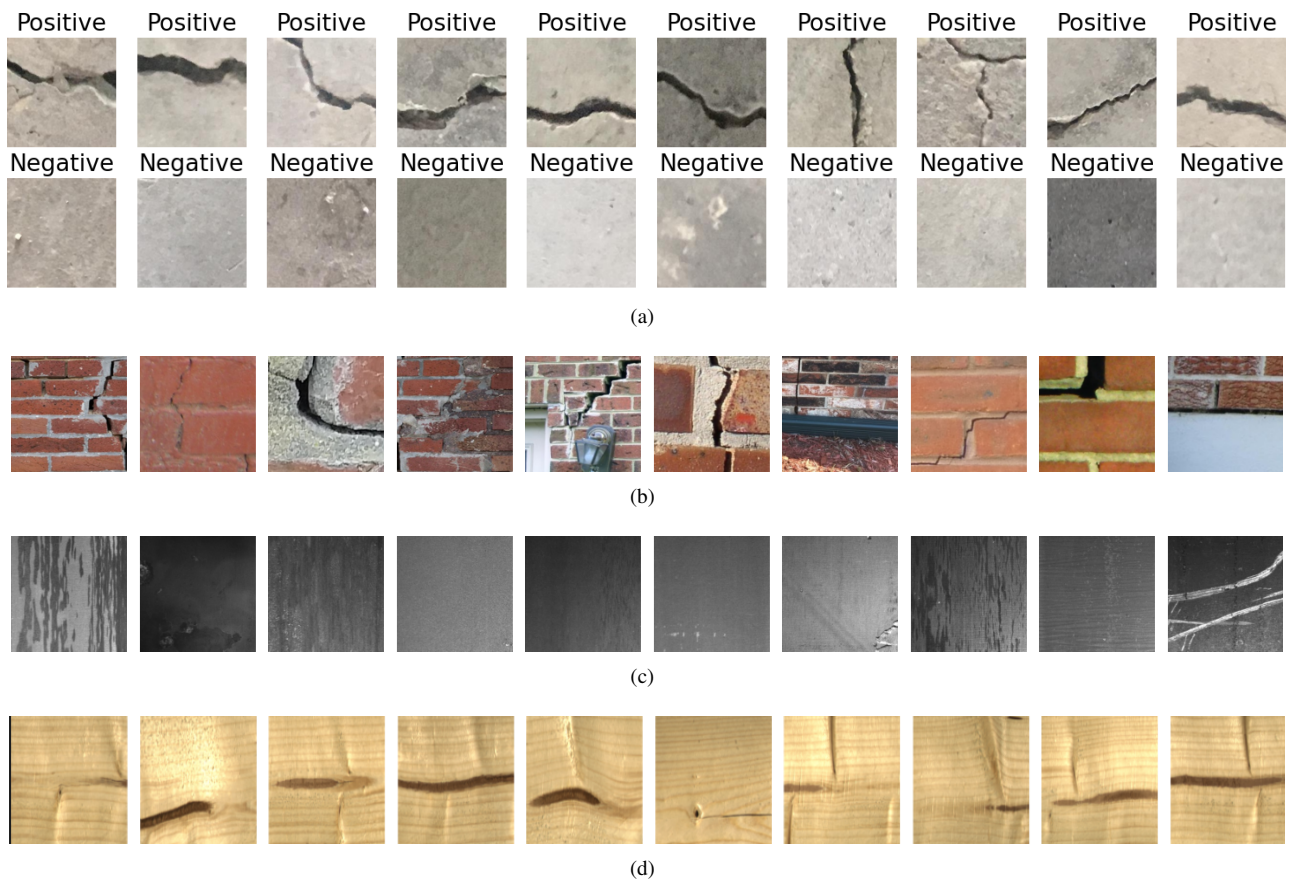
(a) concrete surface crack [26], (b) bricks surface crack [33], (c) steel surface crack [34], and (d) wood surface defect [35].
